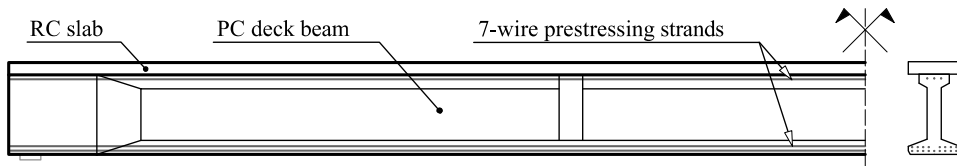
PC bridge deck beams: Longitudinal profile and midspan cross-section.
